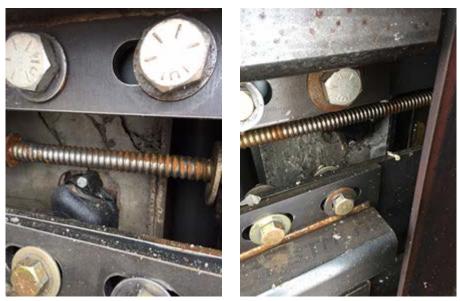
Through-Thickness Cracking along Side Edge in Test 8
